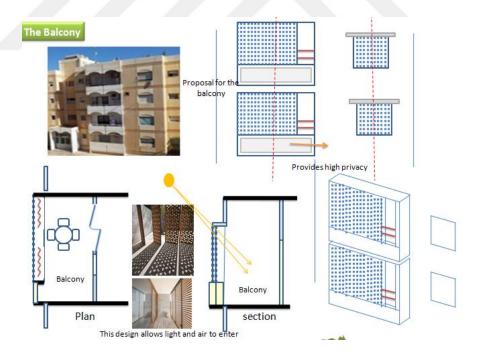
Solution for existing DH and AP 3; the wooden cover of the balcony provides high levels of privacy in addition to lighting and ventilation without affecting privacy.
